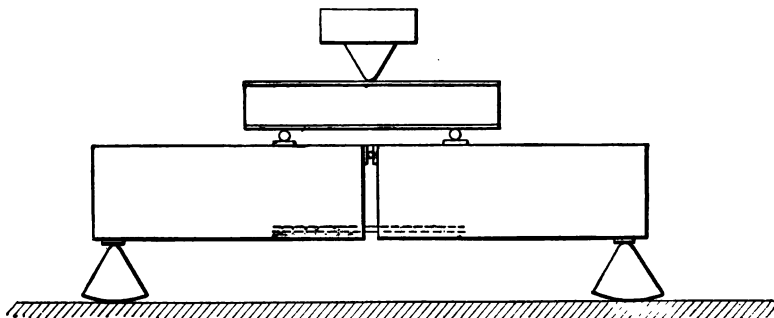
Arrangement of Beam Specimen for Test of Bond
